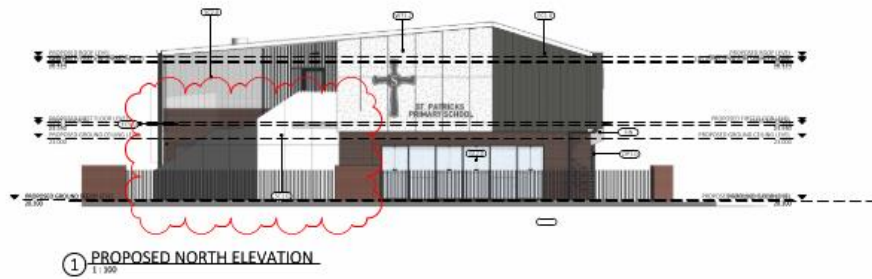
Proposed elevations of the Administration/Learning Facility (Source: Application)
